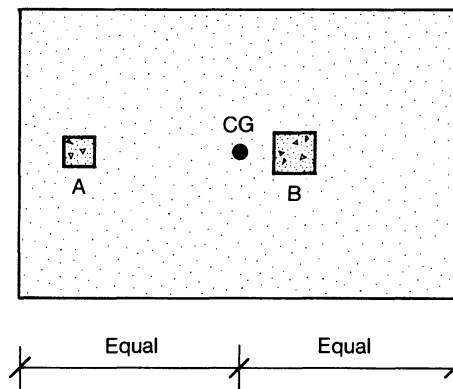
Typical combined footing. Note location of center of gravity.
